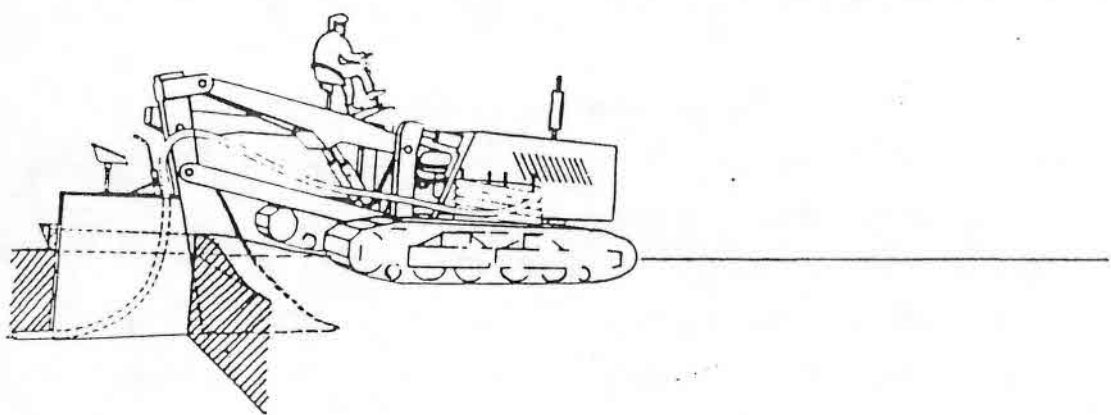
Trenchless pipe drainage machine (Subsoiler type)
